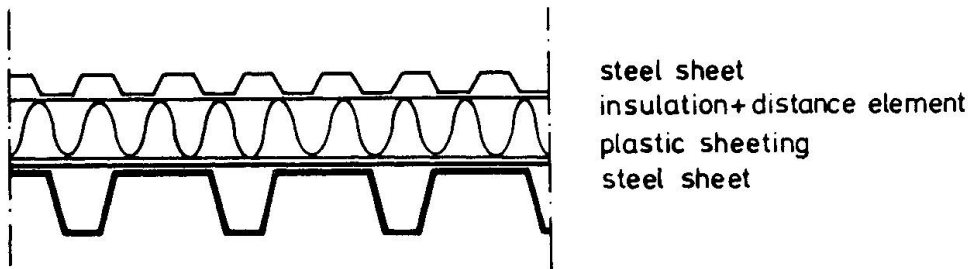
Cross section of a two layer steel sheet roof. Sketch showing the design principles.
